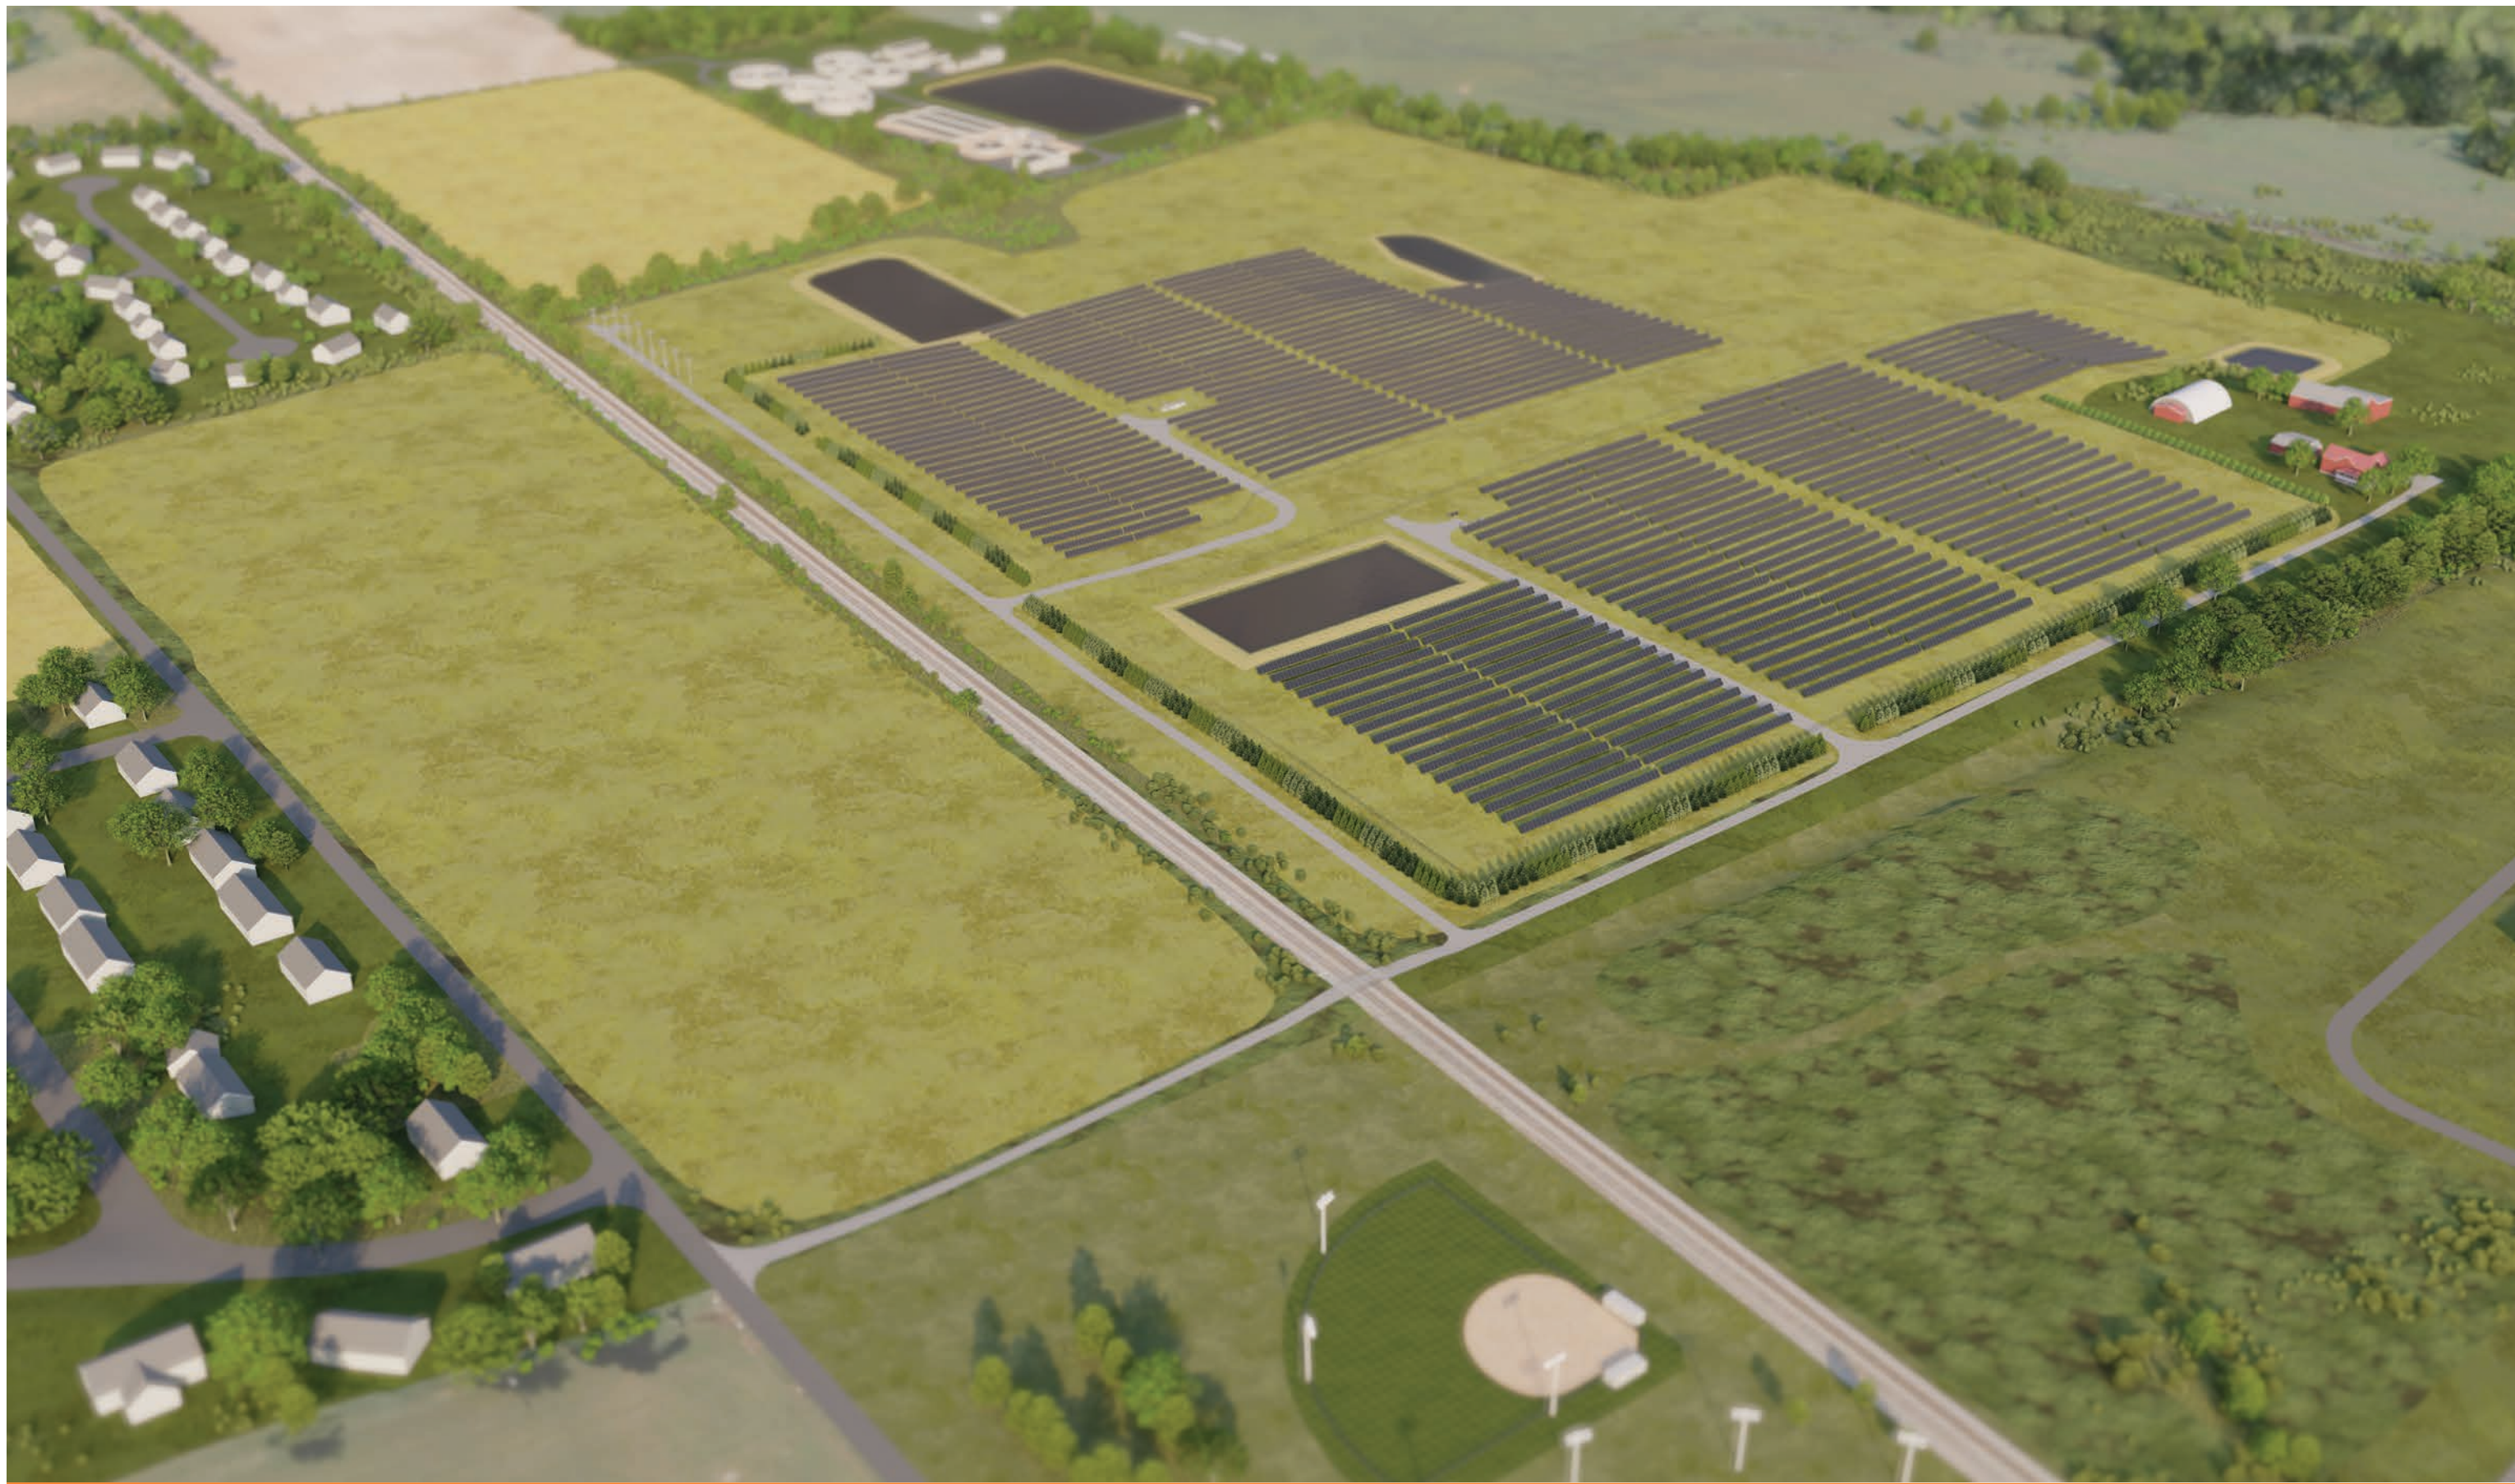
179 Sylvan Drive - Phases 1 and 2
